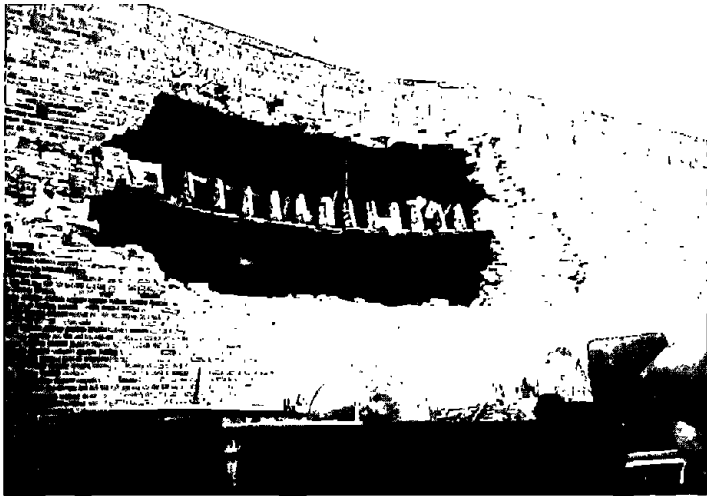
Out of Plane Bending Failure of Retrofit URM Building
